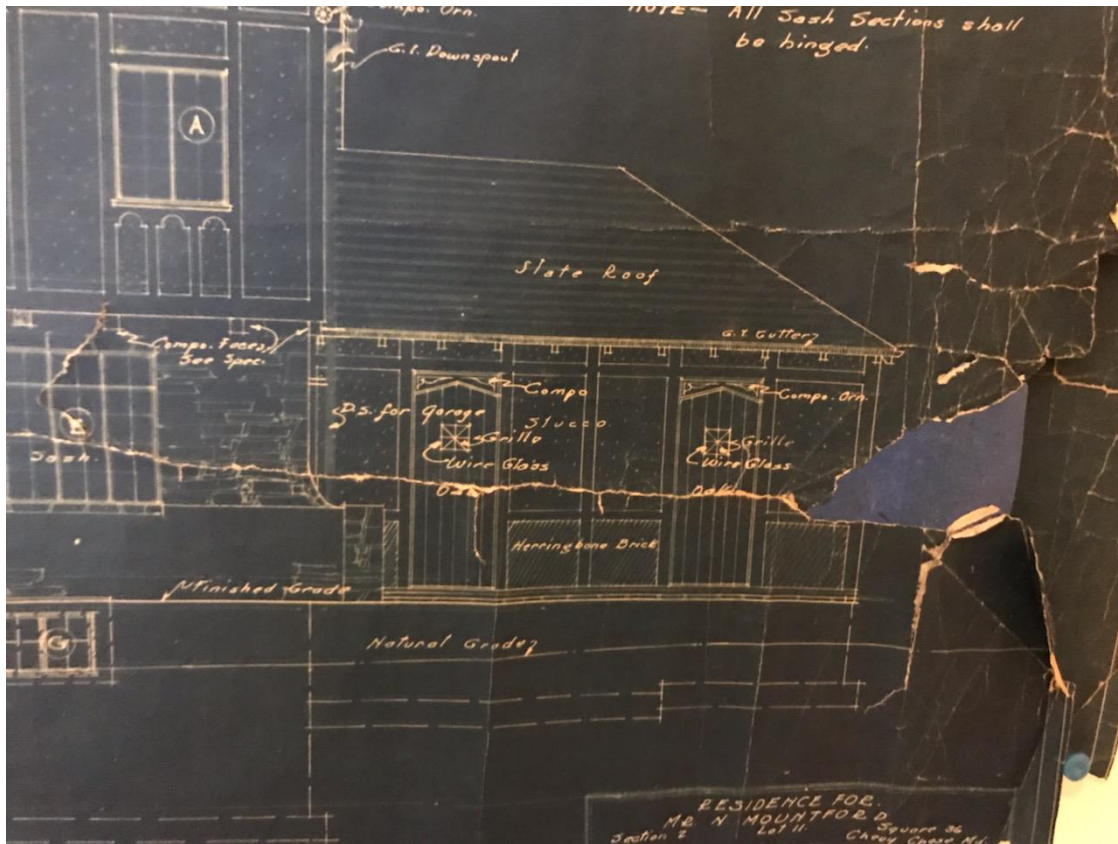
House blueprint, showing the east (left) elevation of the original garage.
